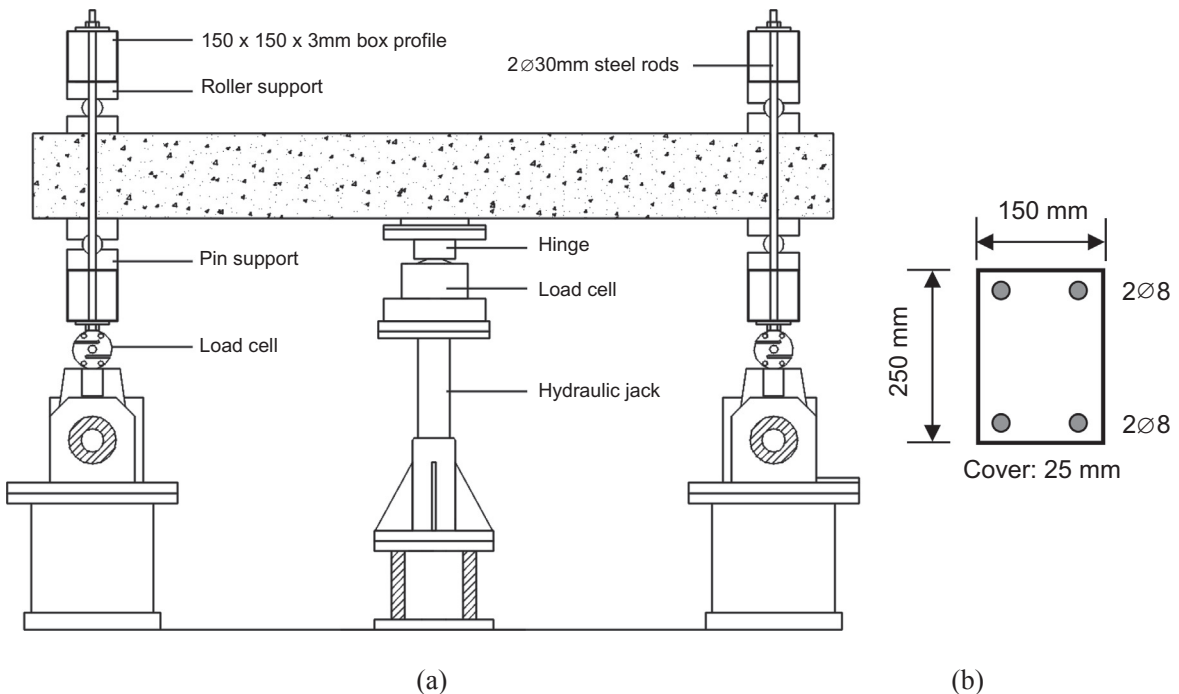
(a) Test setup, (b) Section details of the specimens.
